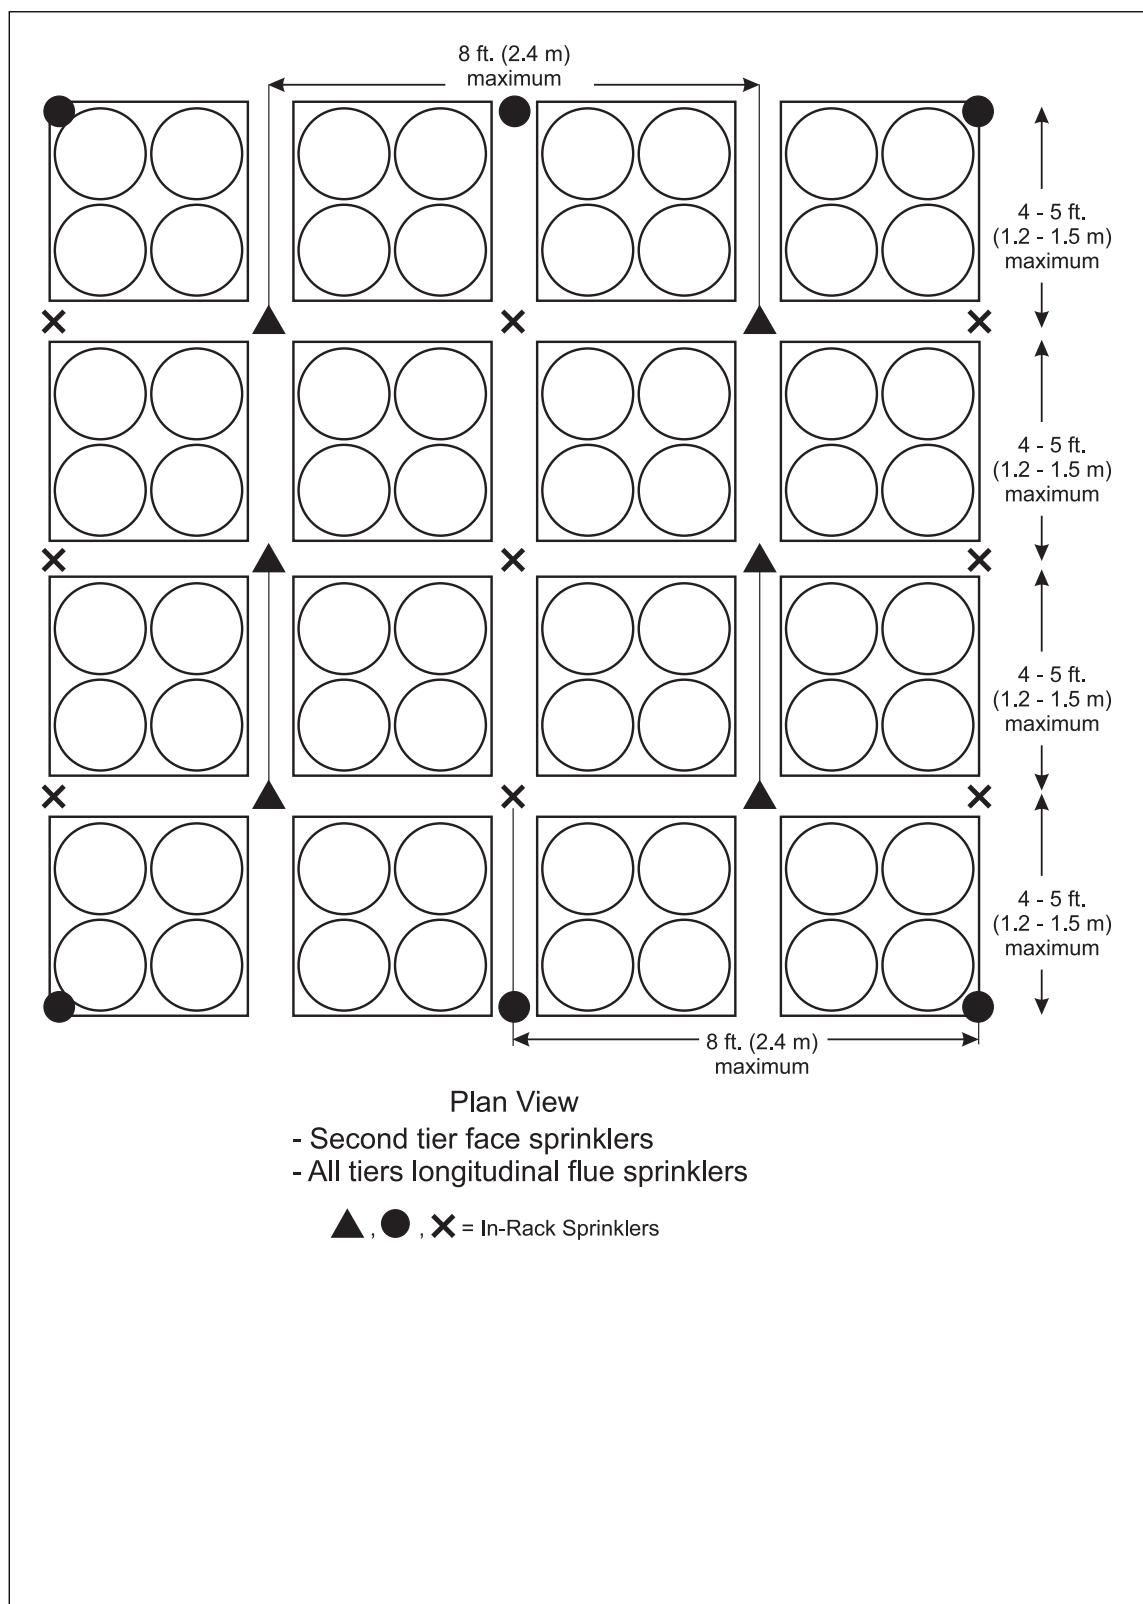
Multiple-row rack sprinkler layout: drum protection scheme (plan view)
